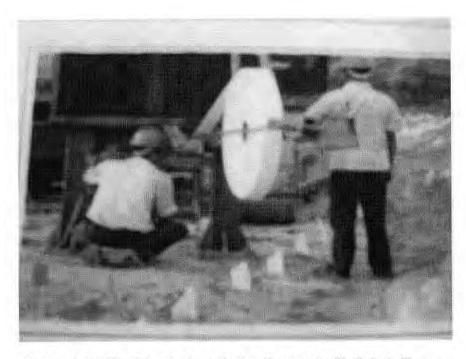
Flexi Drain Installation Process in Kaliakoir Bypass
